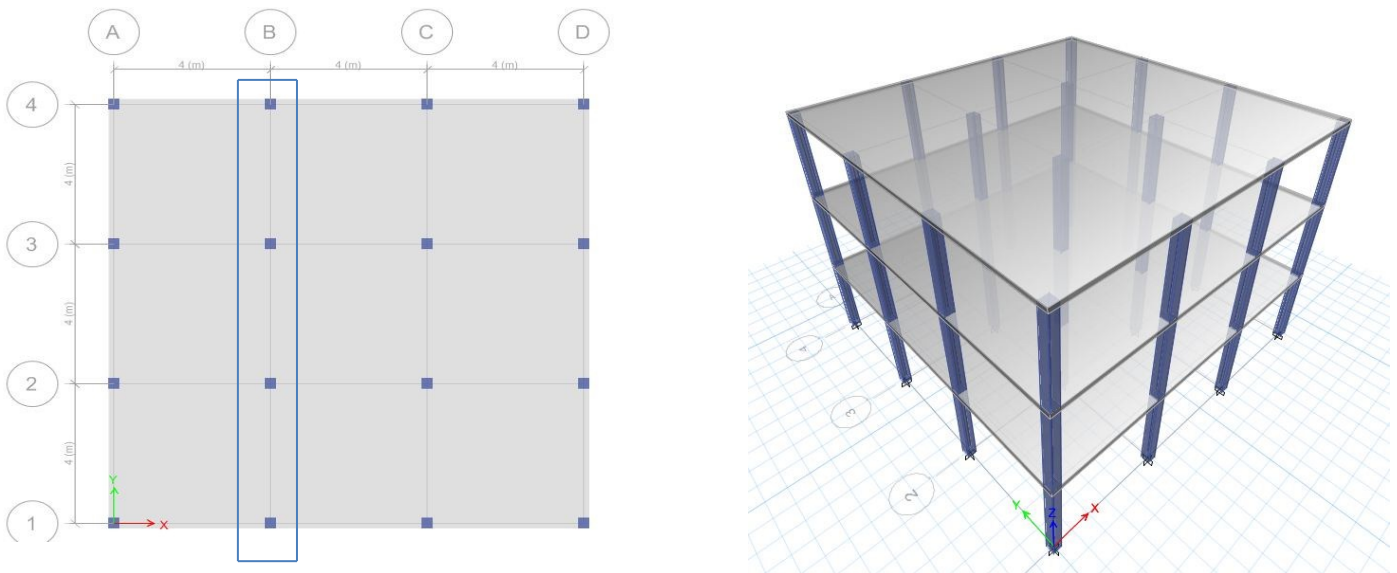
1 : Plan and 3D of 3-Storey Model Building (ETABS 2016)
